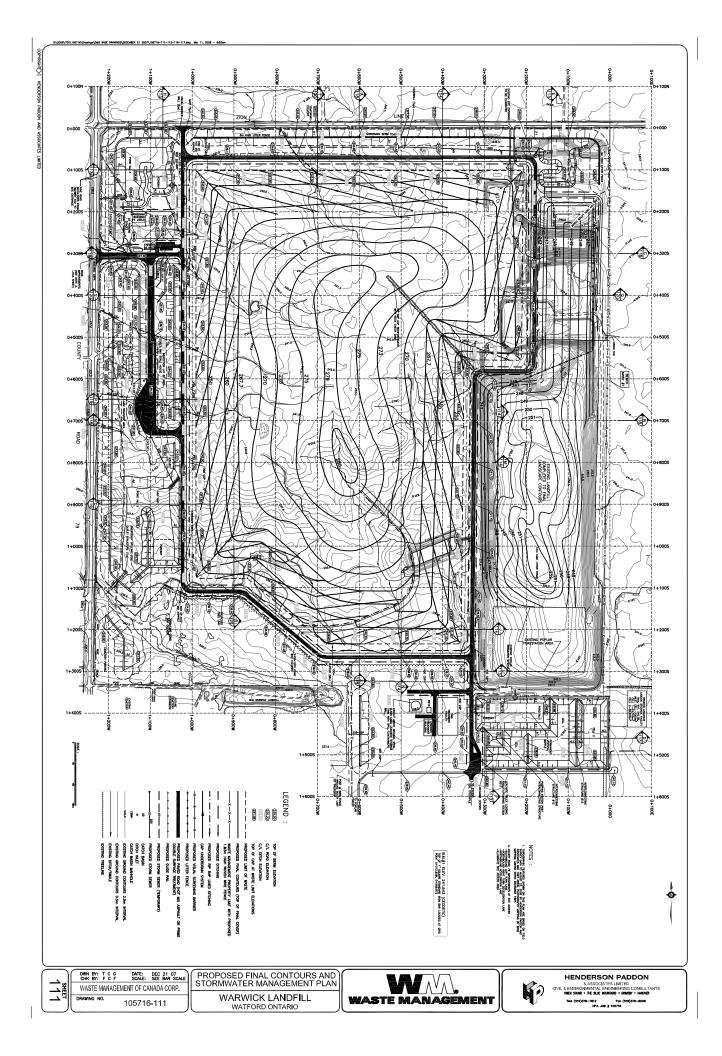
Proposed Final Contours and Stormwater Management Plan
